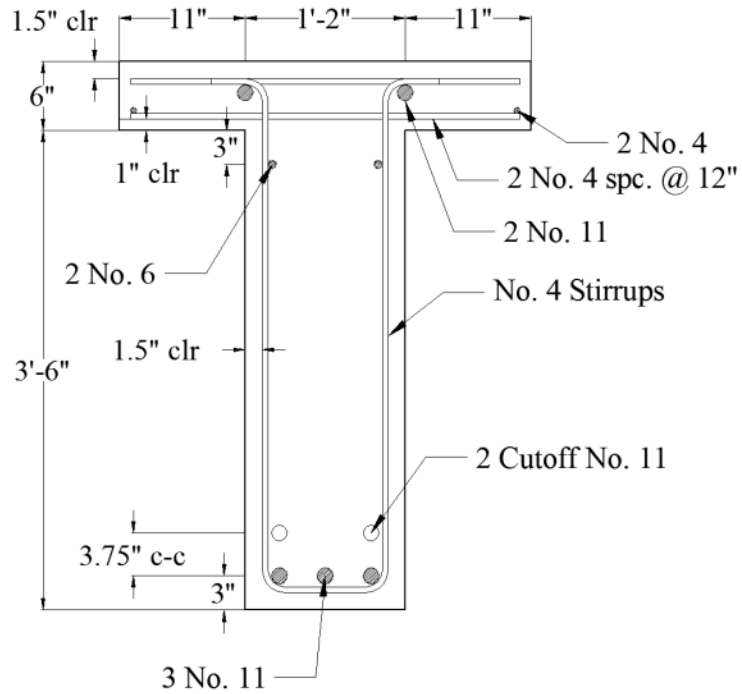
Cross section of SPR T.45.Ld3(10).
